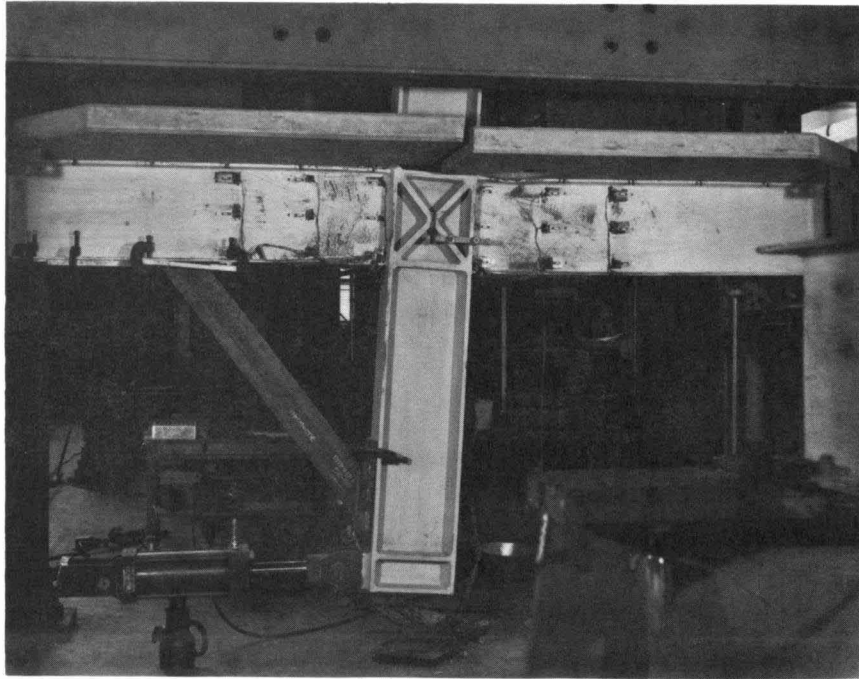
Specimen J1 After Testing Showing Brace in Region 3
